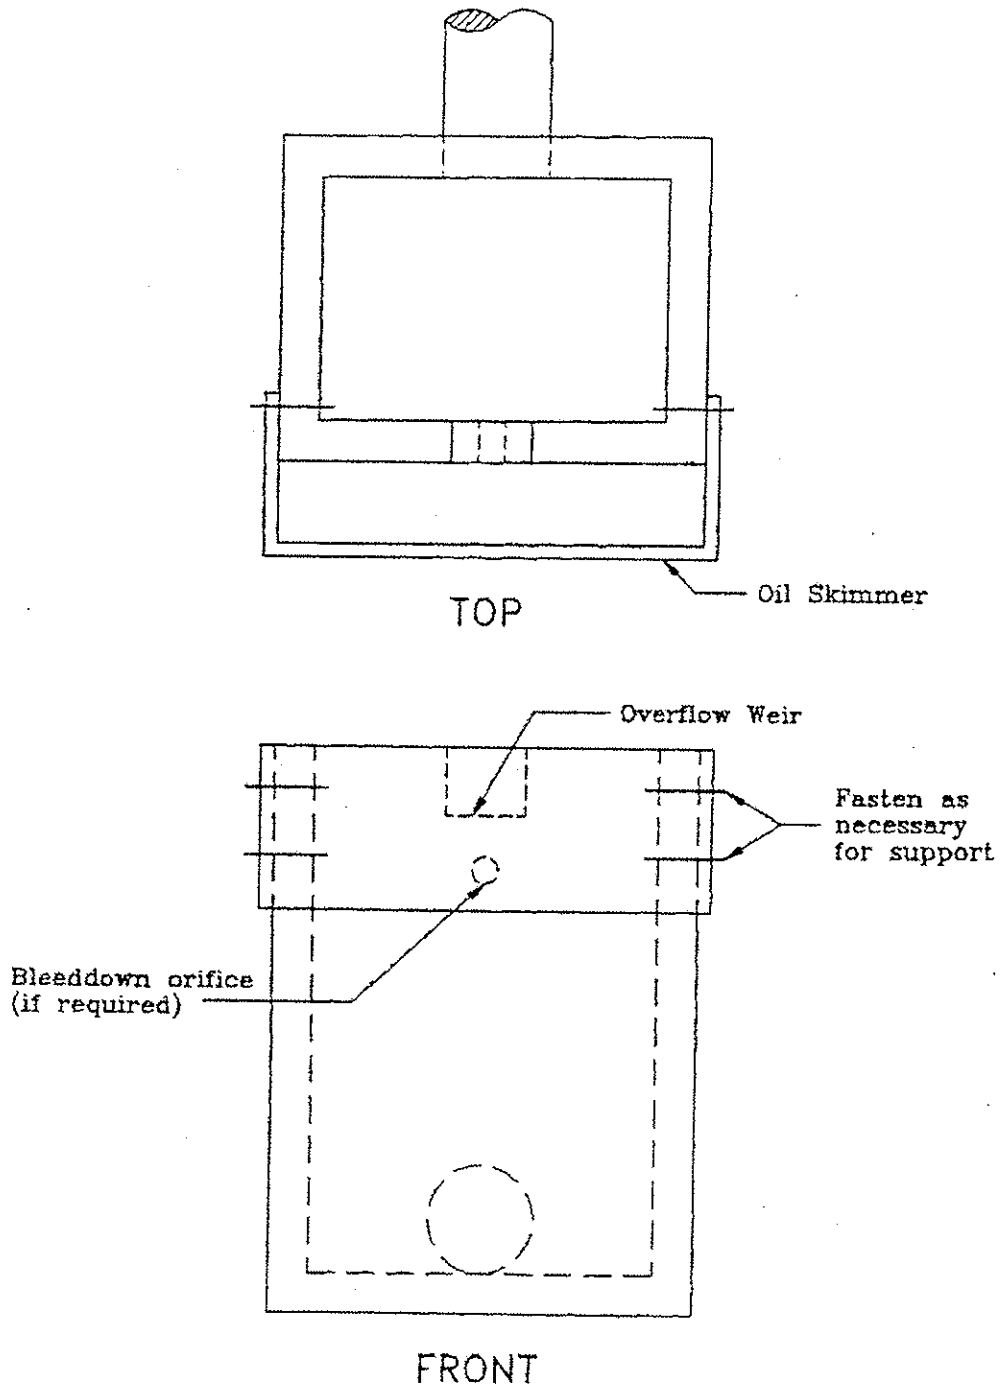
Oil skimmer detail for a typical outfall structure (N.T.S.)
